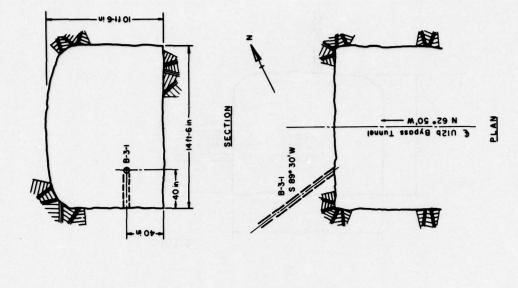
Detail plan and section of site 1 -- tunnel B - drift B.01
